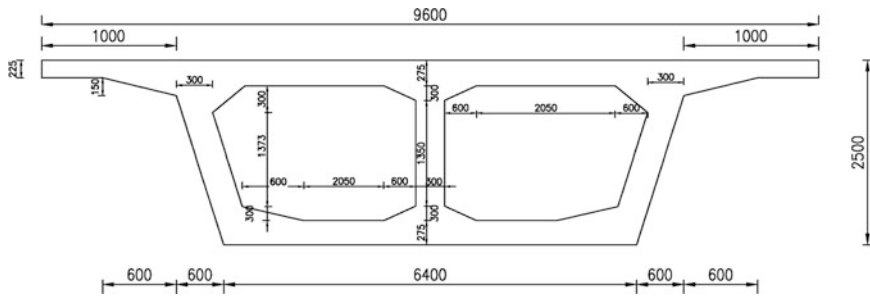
Details of geometry and dimension of the deck (All dimension in mm)
